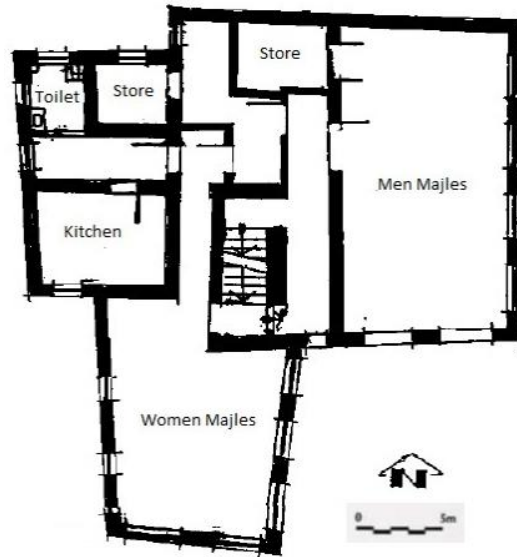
Sheikh Abu Bakr House (Second Floor) Mukalla (Al-Maashi, 1998)
